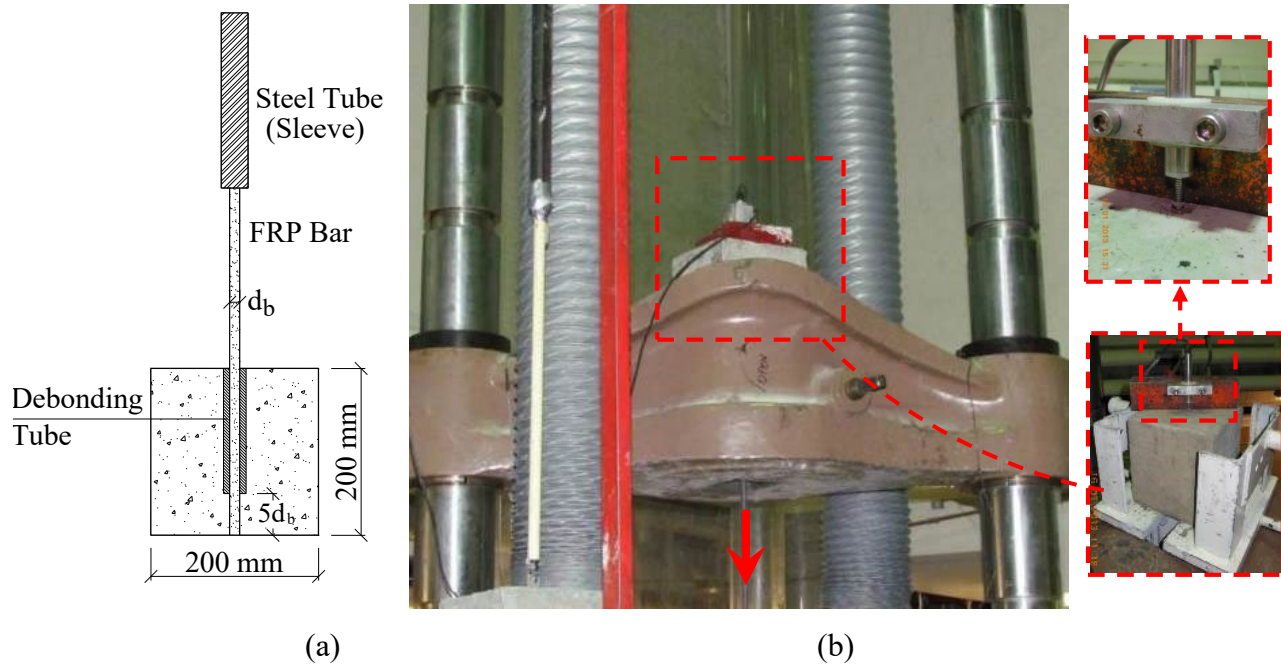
Pullout test: (a) Specimen geometry; (b) Test setup
